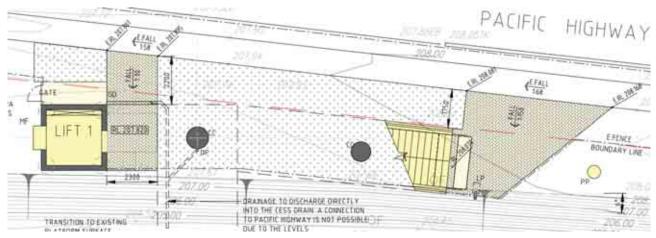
Access to Lift 1 and Stair 1 from Pacific Highway
